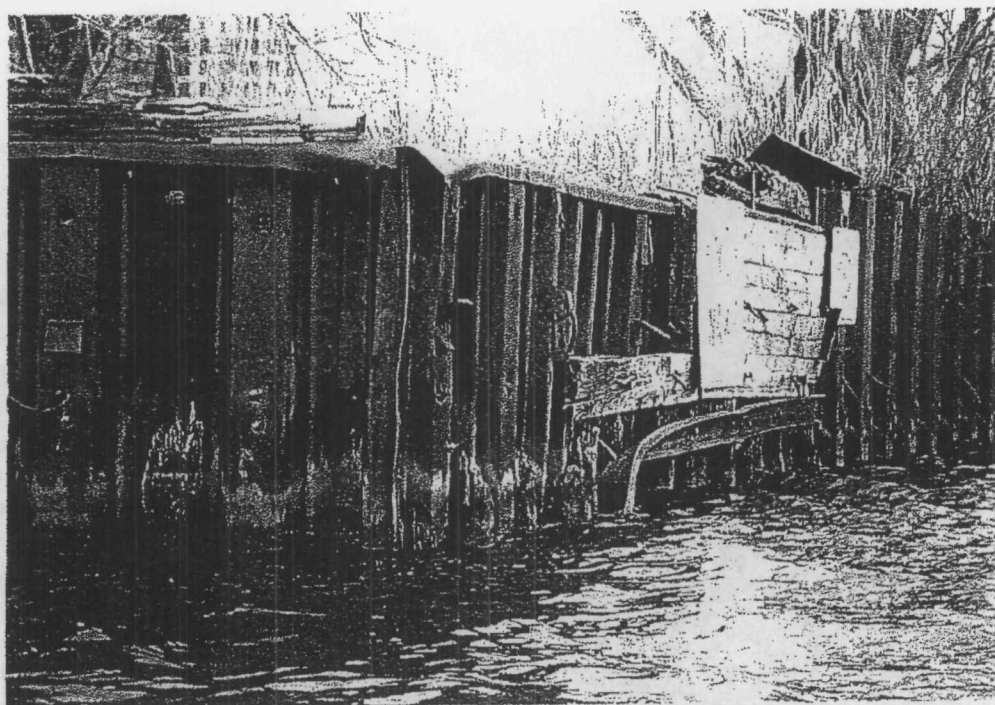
View of Dockwall at Station 2+00, Looking North.
